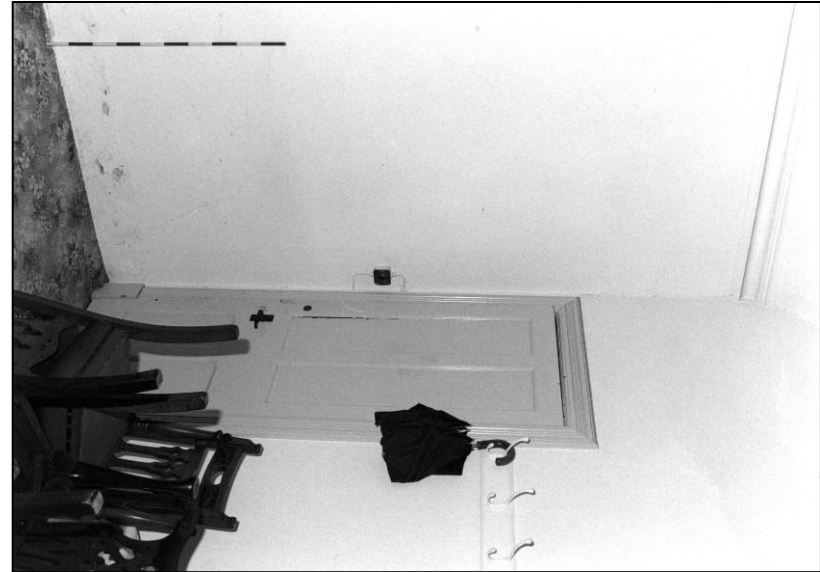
Church: E vestry, looking SW (photo 10/9) (top to right).
